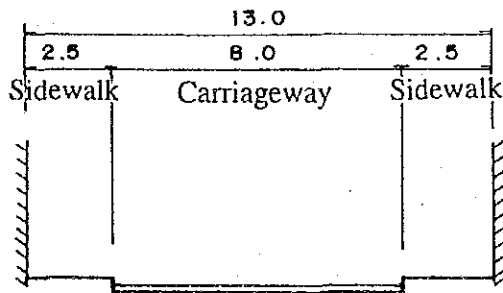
Typical Cross-Section of New Bagmati Bridge
